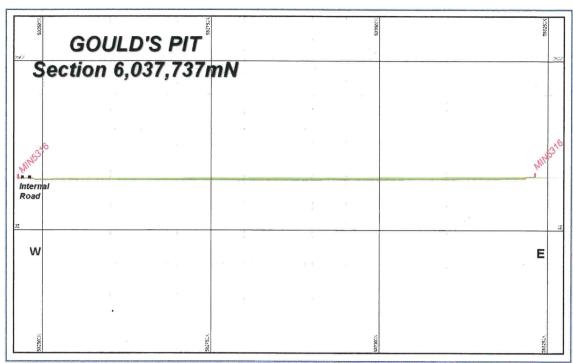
Transverse Section thru Proposed Gould's Pit (6,037,737mN).
